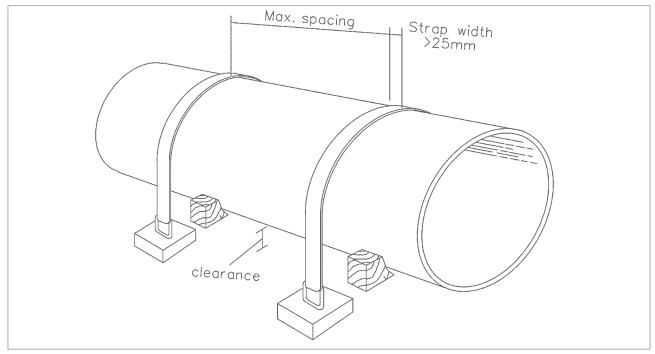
Anchoring of Pipes Prior To Concrete Pouring
